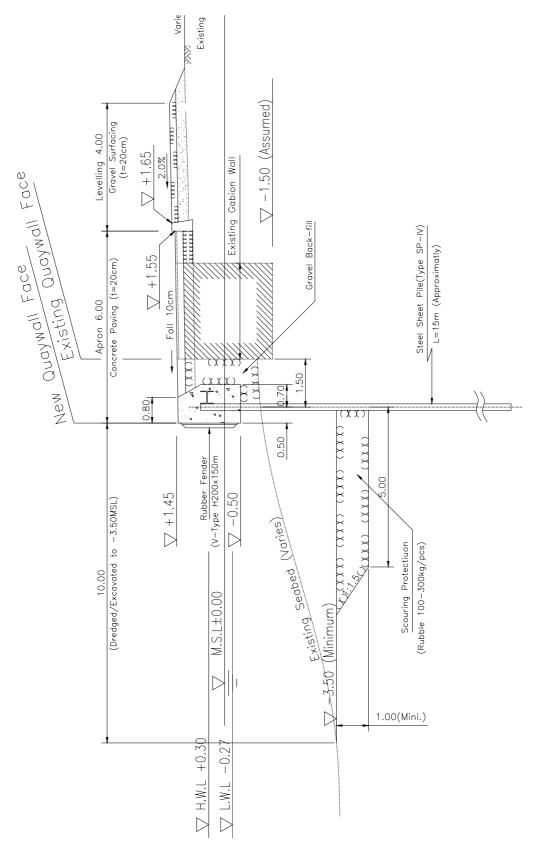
Typical cross section of quay wall (steel sheet pile type)
